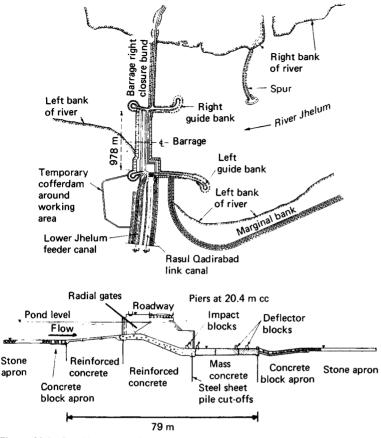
Rasul barrage on the river Jhelum, Pakistan. General layout (top), longitudinal section (above). Note the flow from right in layout (top) and from left in section. (Consulting Engineers: Coode and Partners)
